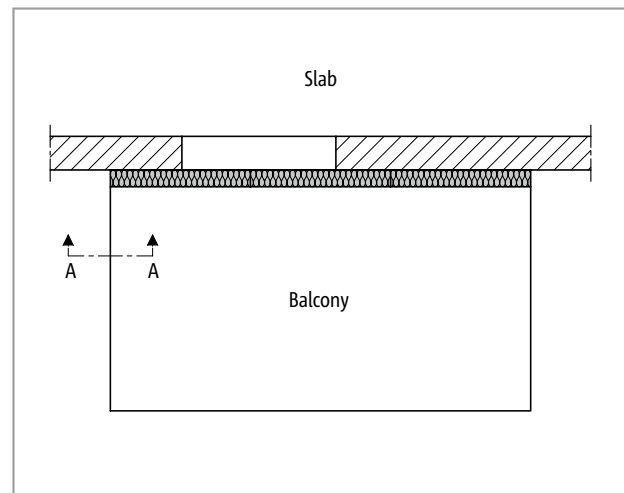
Schöck Isokorb® XT type K: Representation of the position of the cross-section A-A
